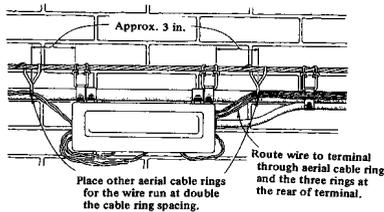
Running Wires to Terminal Installed on Strand Supporting Block Cable Attached to a Building
